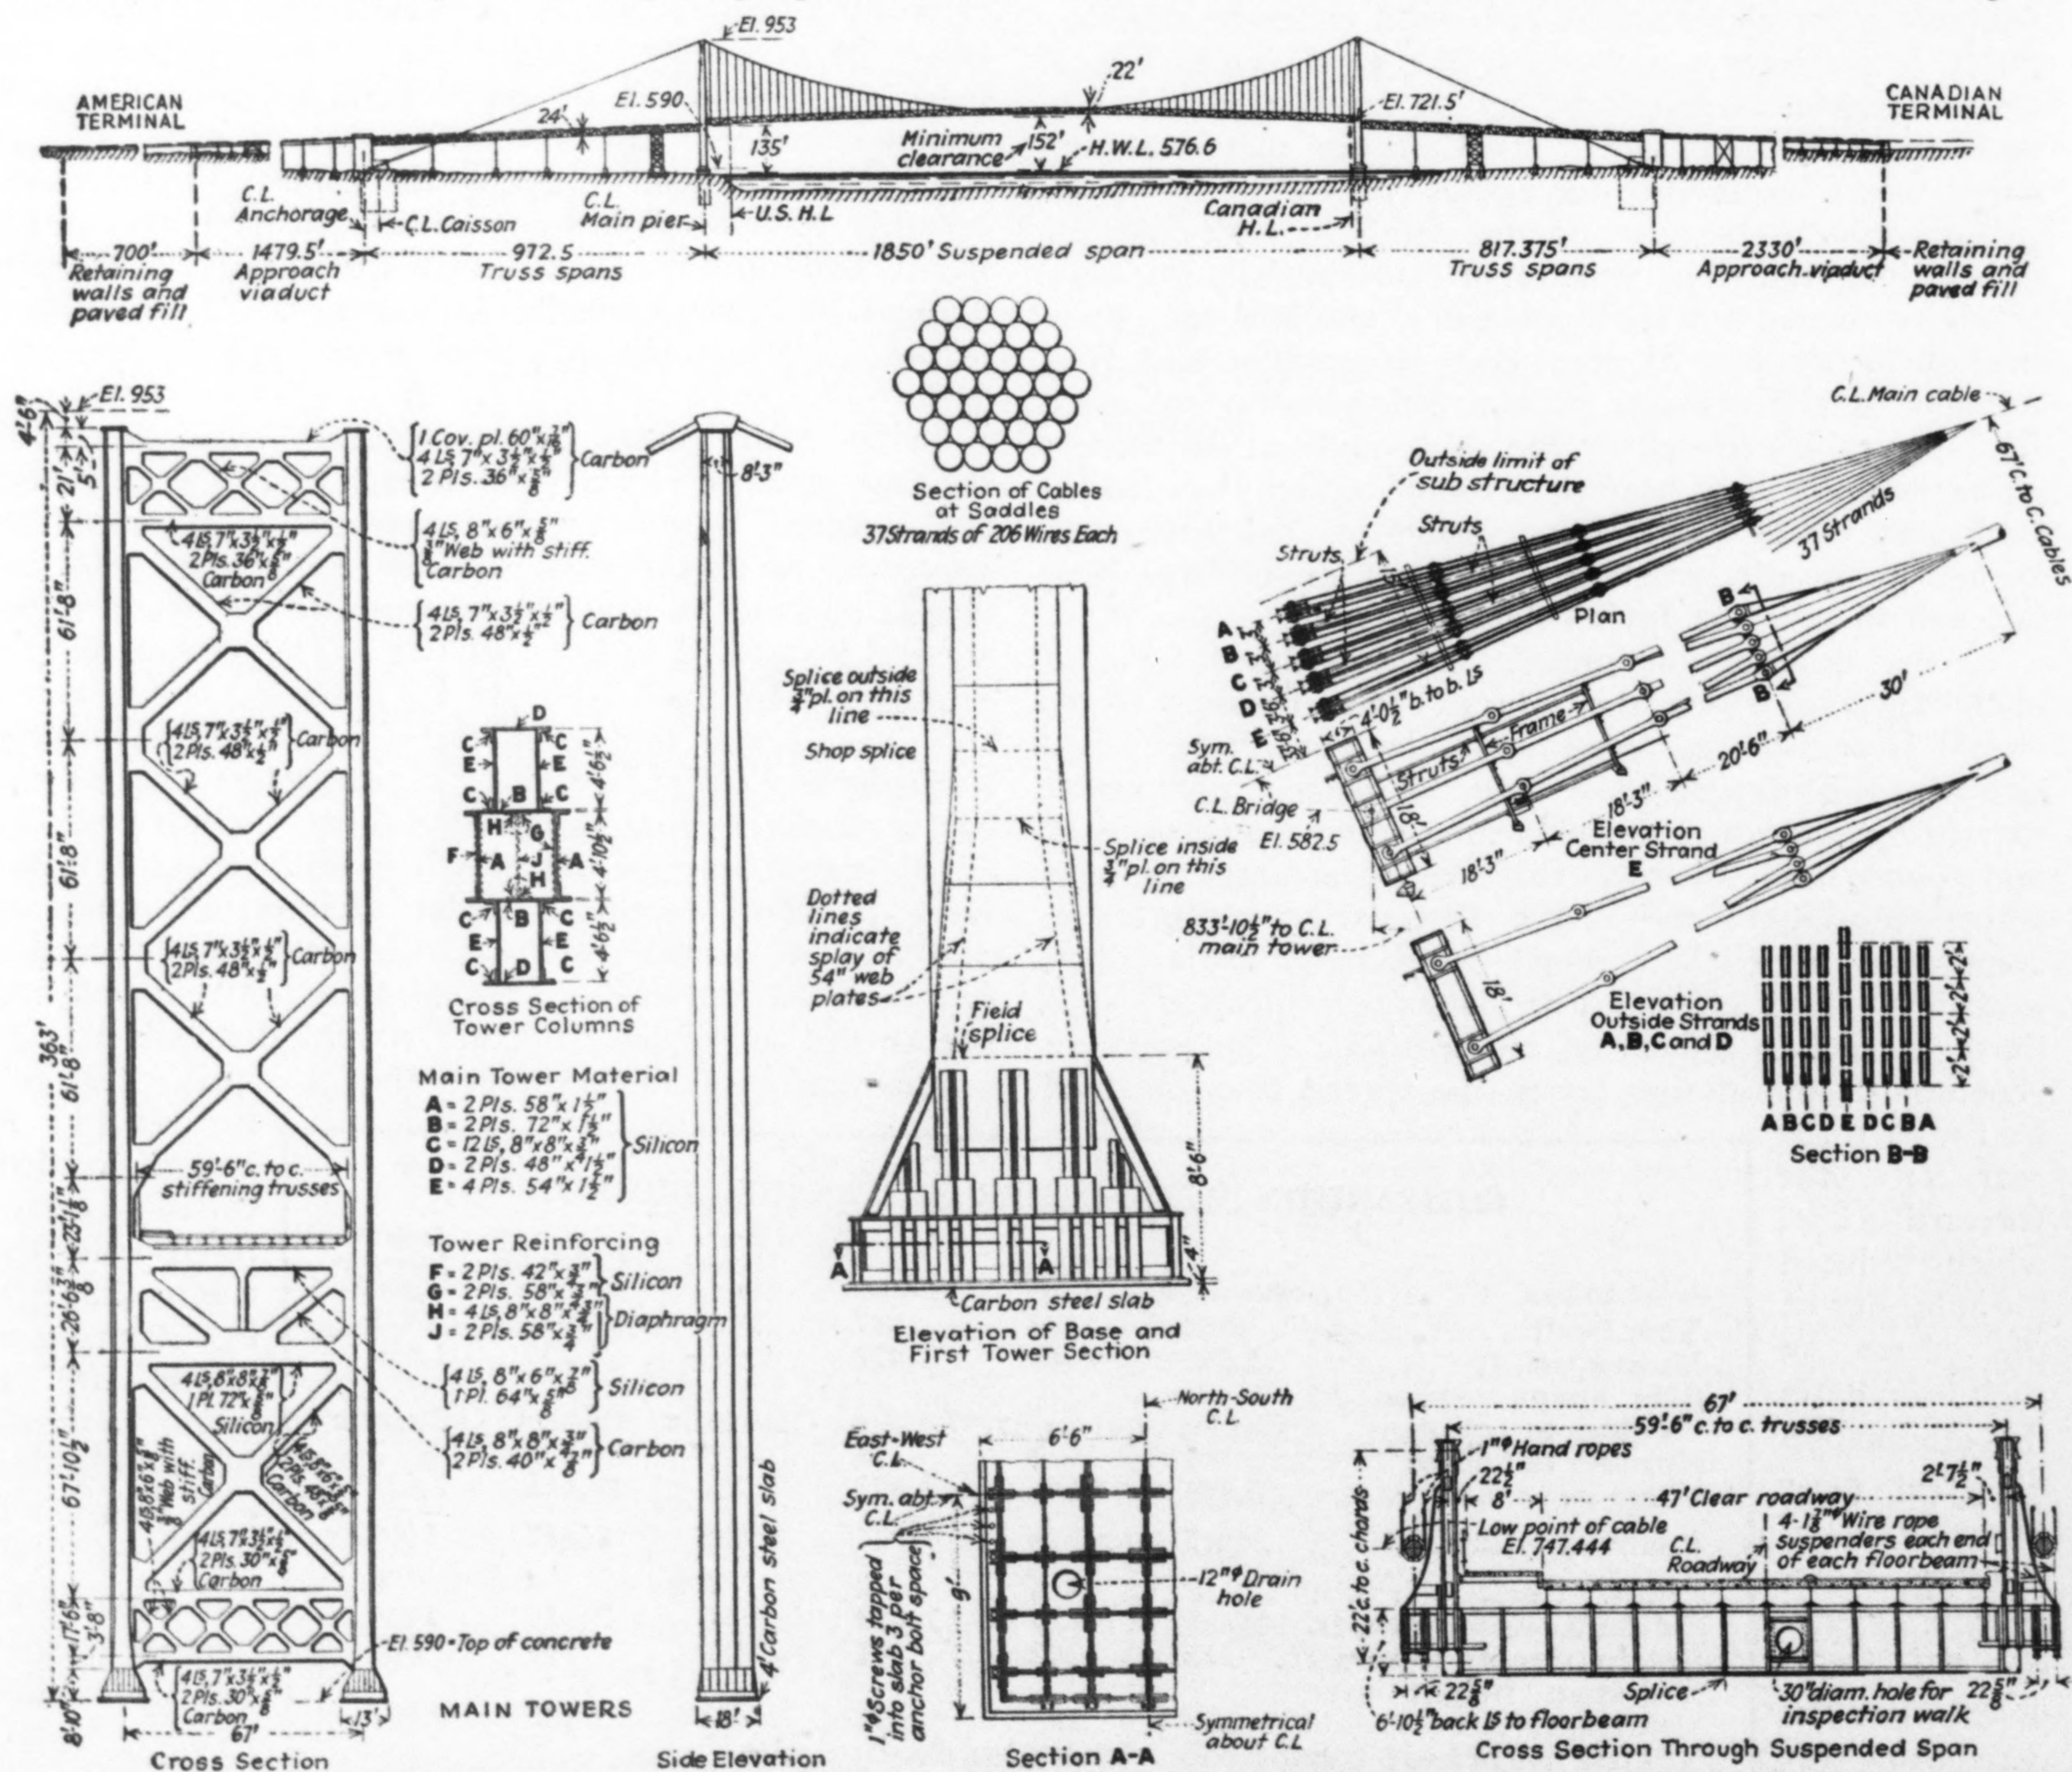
ELEVATION AND DETAILS OF 1,850-FT. SPAN SUSPENSION BRIDGE OVER DETROIT RIVER
